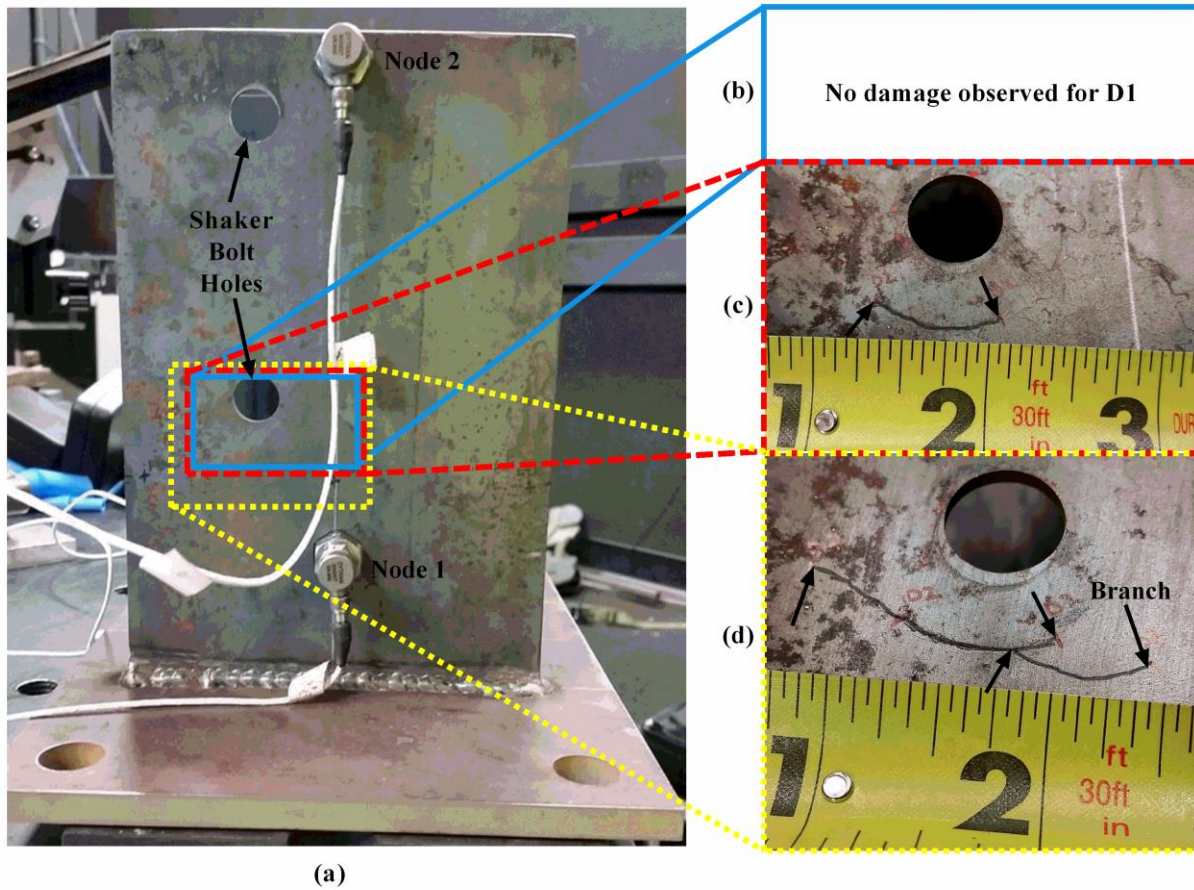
Damage caused in Specimen 2 - Side A: (a) overall side view indicating locations of damage, (b) no crack was observed (D1), (c) 19 mm crack (D2), (d) 32 mm crack with an approximately 19 mm crack branching from 6 mm in from the right crack tip (D3H)
